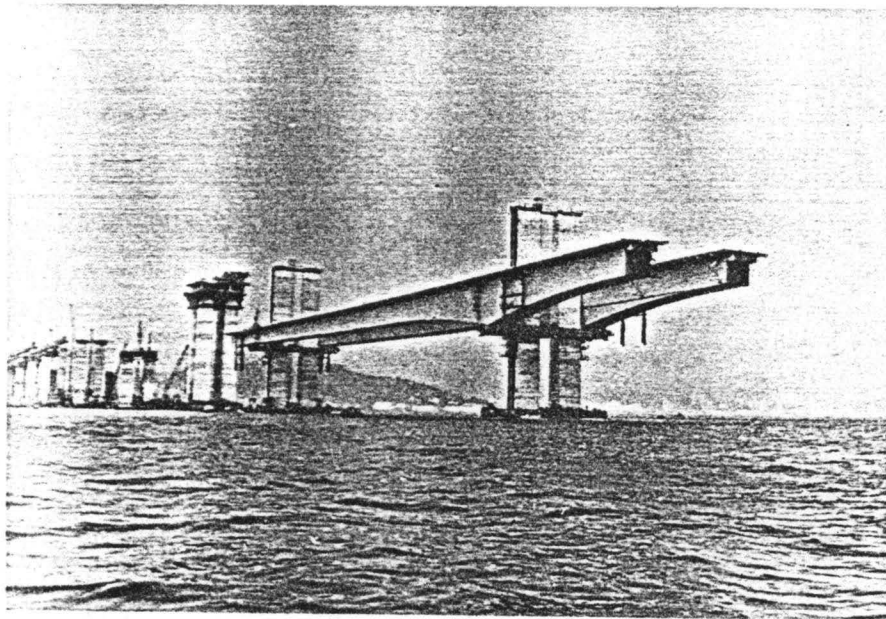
Side Spans Being Jacked to Top of Piers
